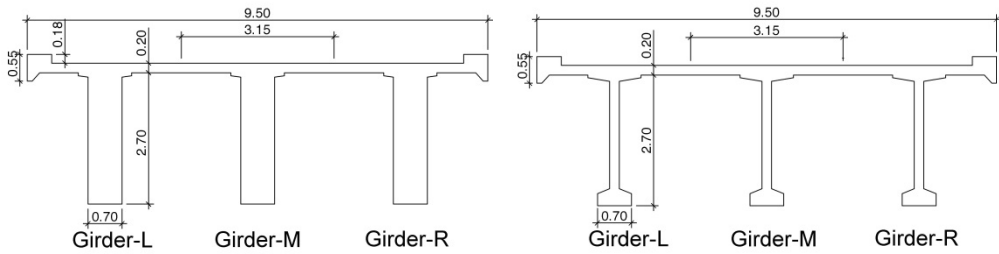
Elevation layout of 'Viadotto Serrone' (Unit: m)
